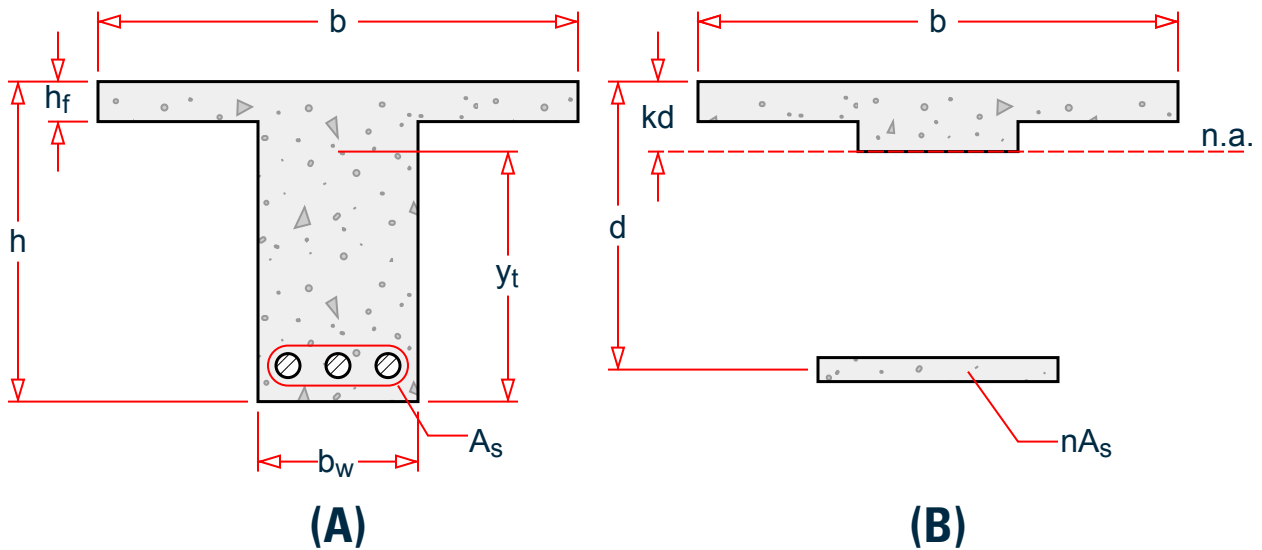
Gross and cracked transform sections for tee shapes without compression steel
